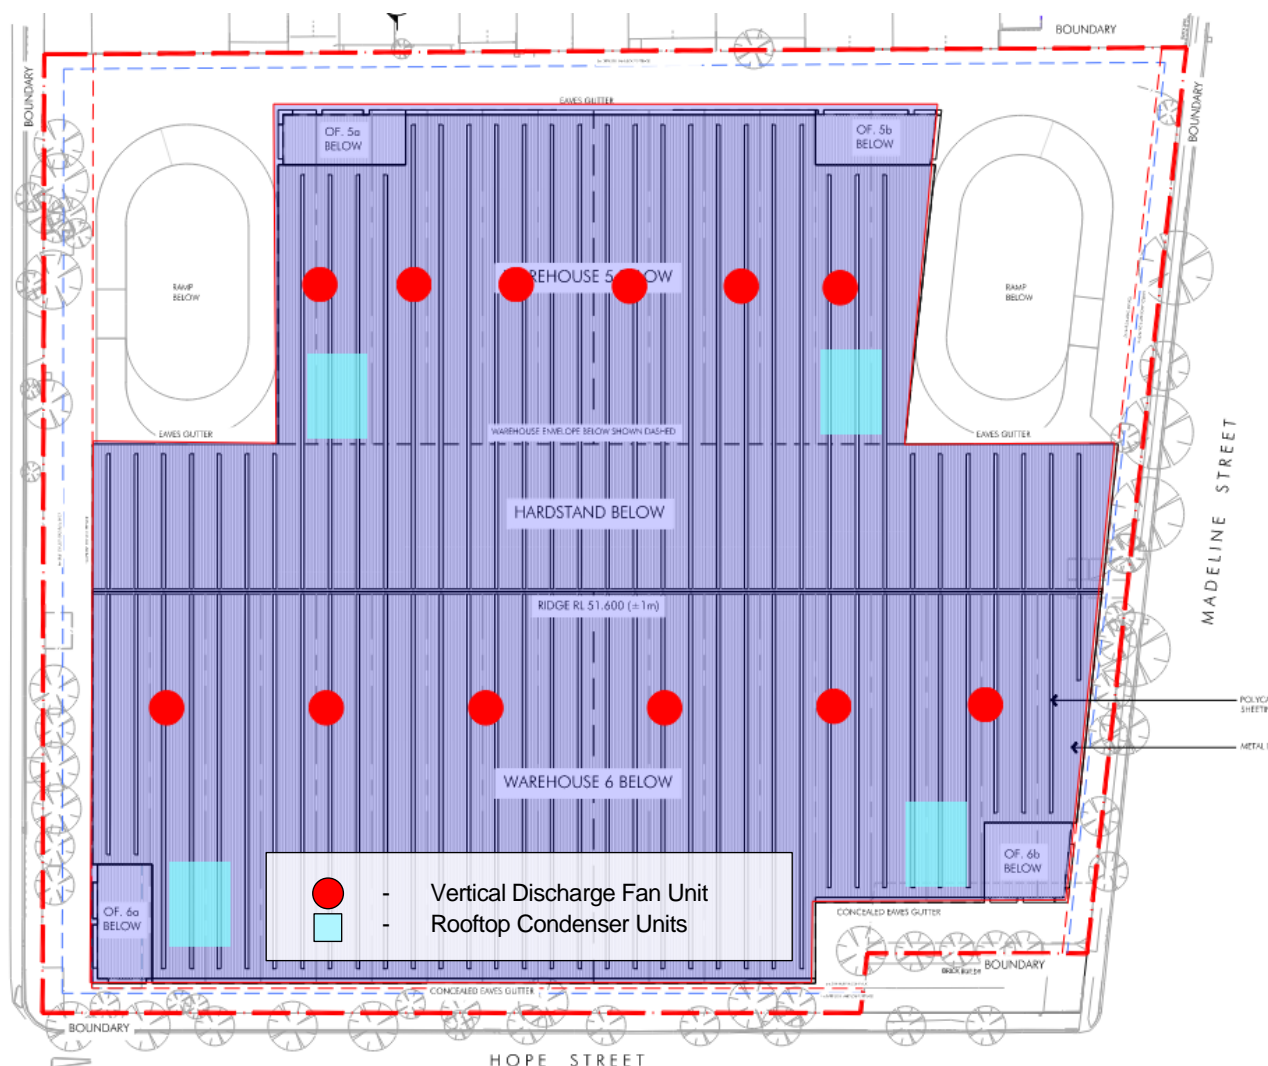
Mechanical plant equipment location adopted for acoustic modelling – Roof
